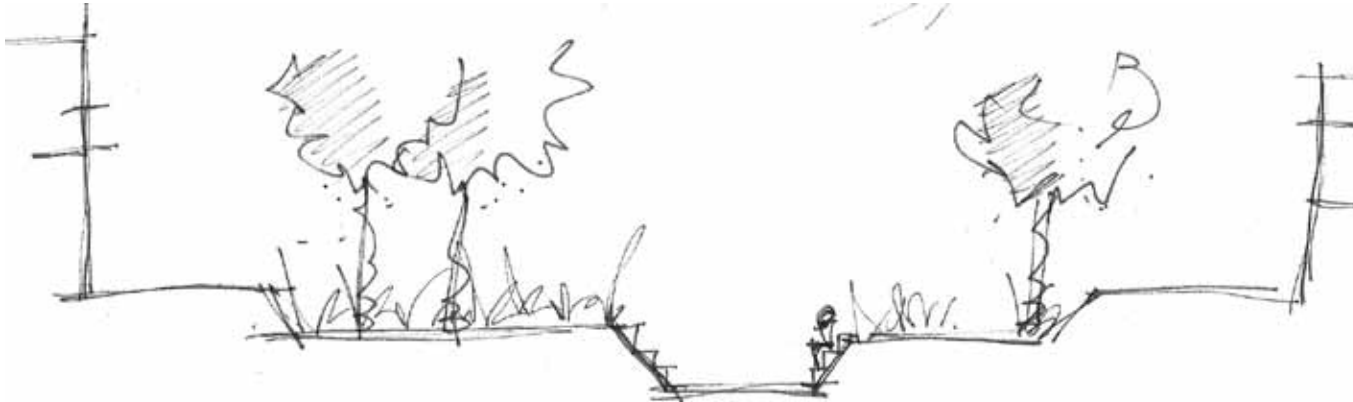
REVISED WATER PARK SECTION (AUTHOR, 2011)
